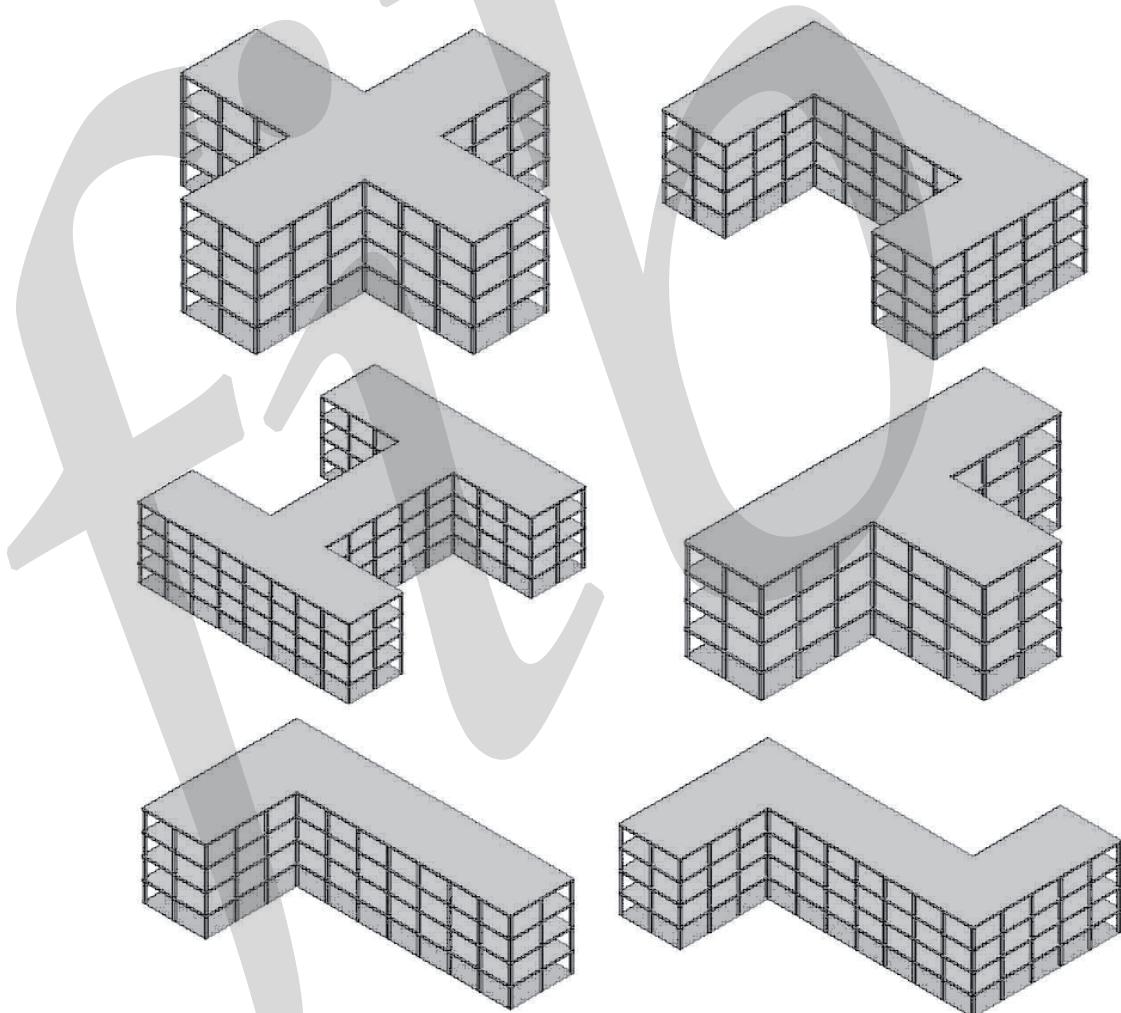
Special attention should be given to these more complex building plan configurations
